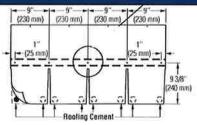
Fastening Hatteras Sbingles on Steep Slopes
